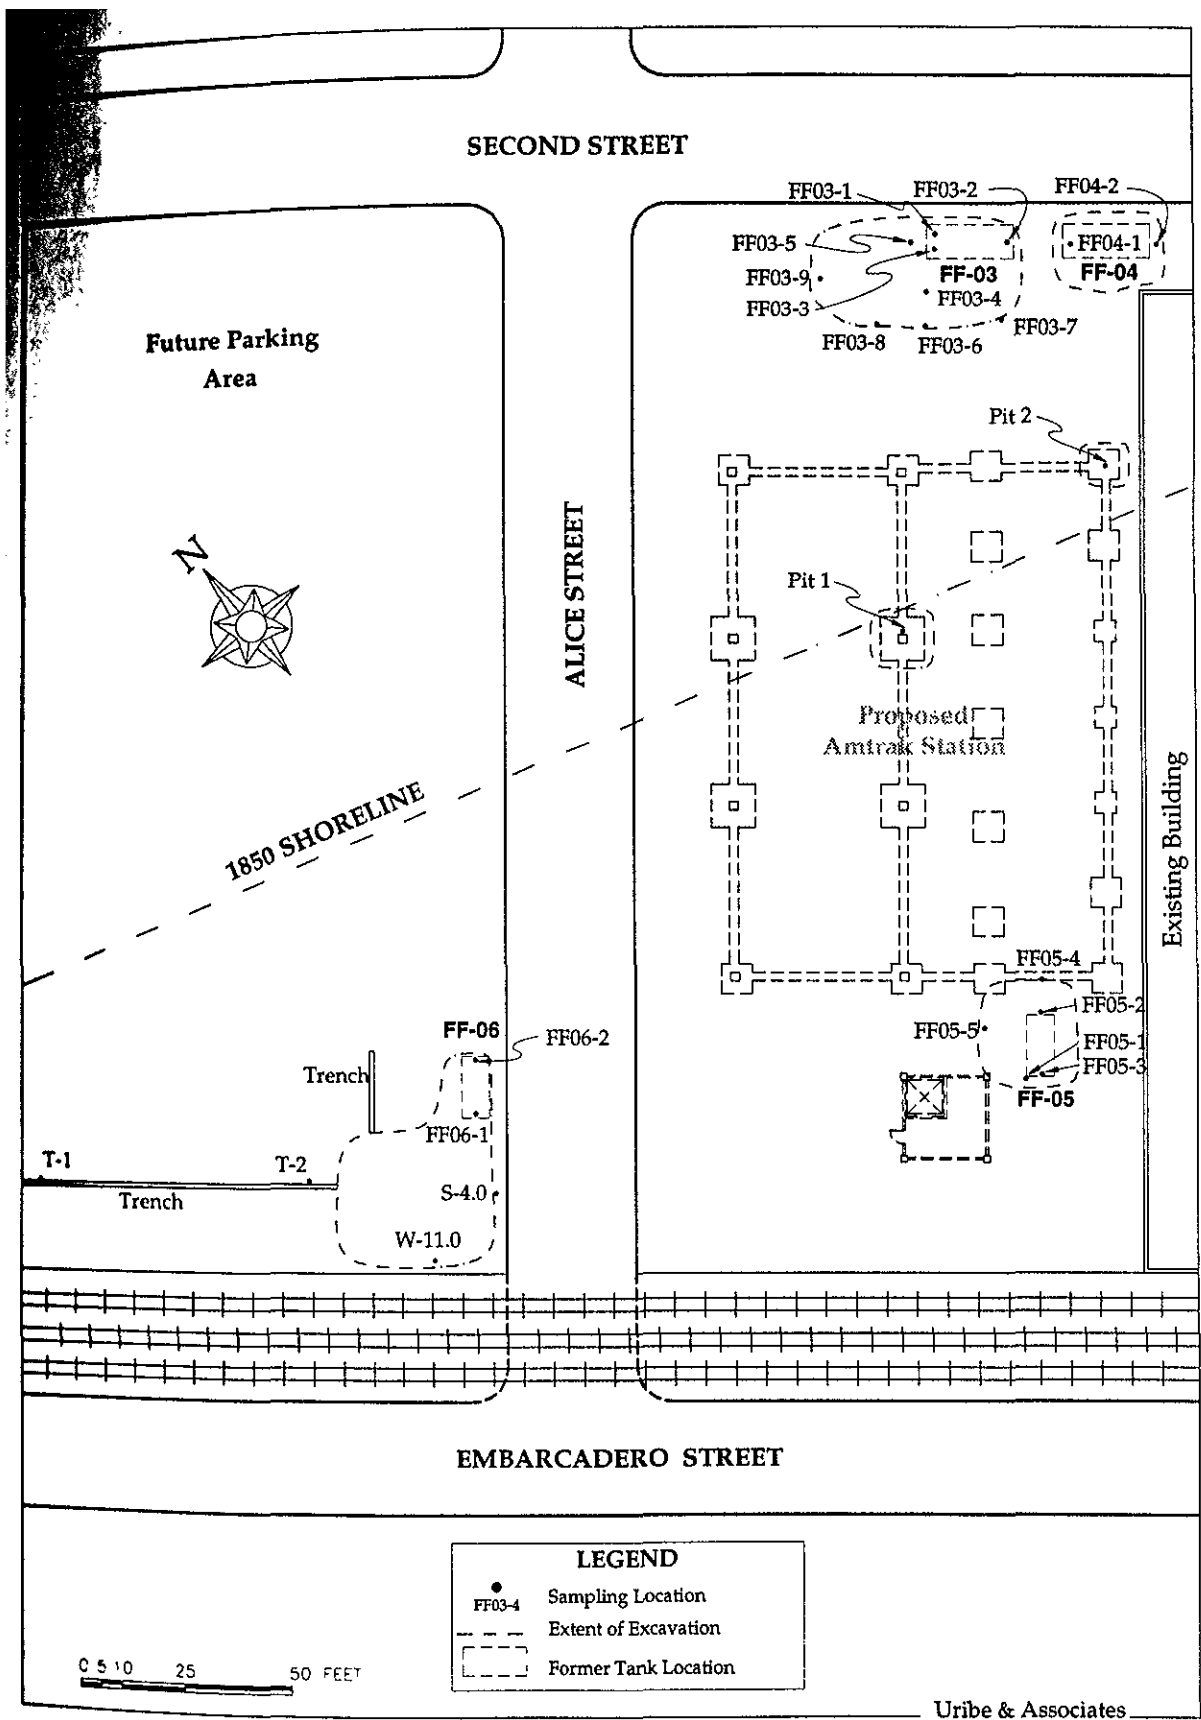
Site Plan, with Sample Locations and Extent of Excavation
